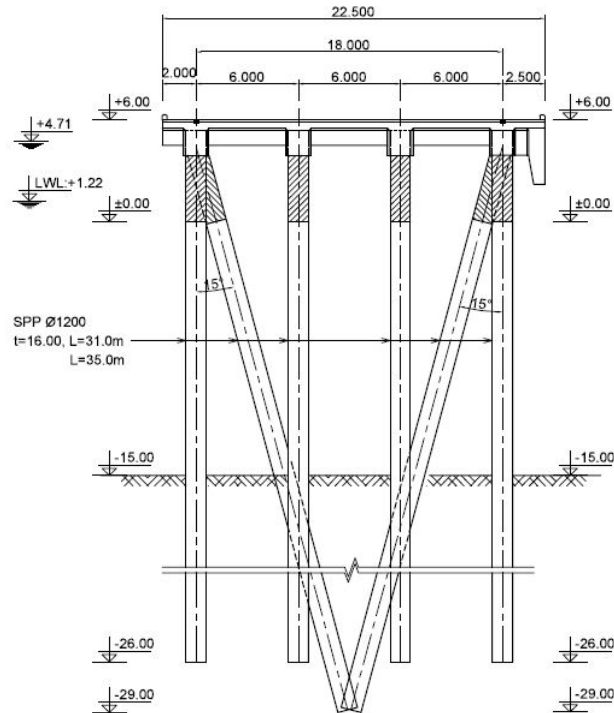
Typical Cross Section of Offshore Unloading Berth
